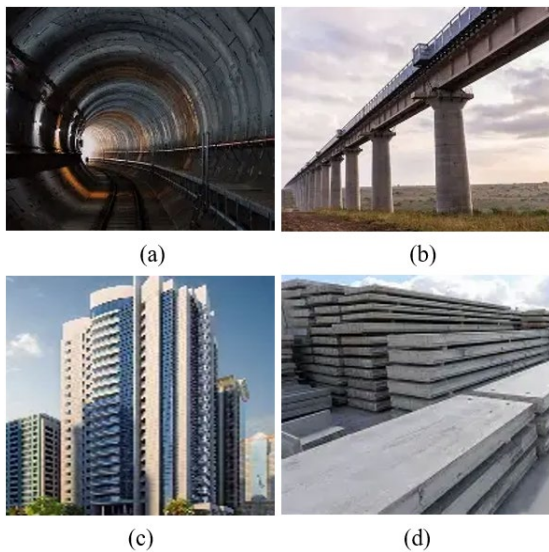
Application of SCC concrete: a) tunnels, b) bridge pillars, c) high-rise building, d) precast concrete
